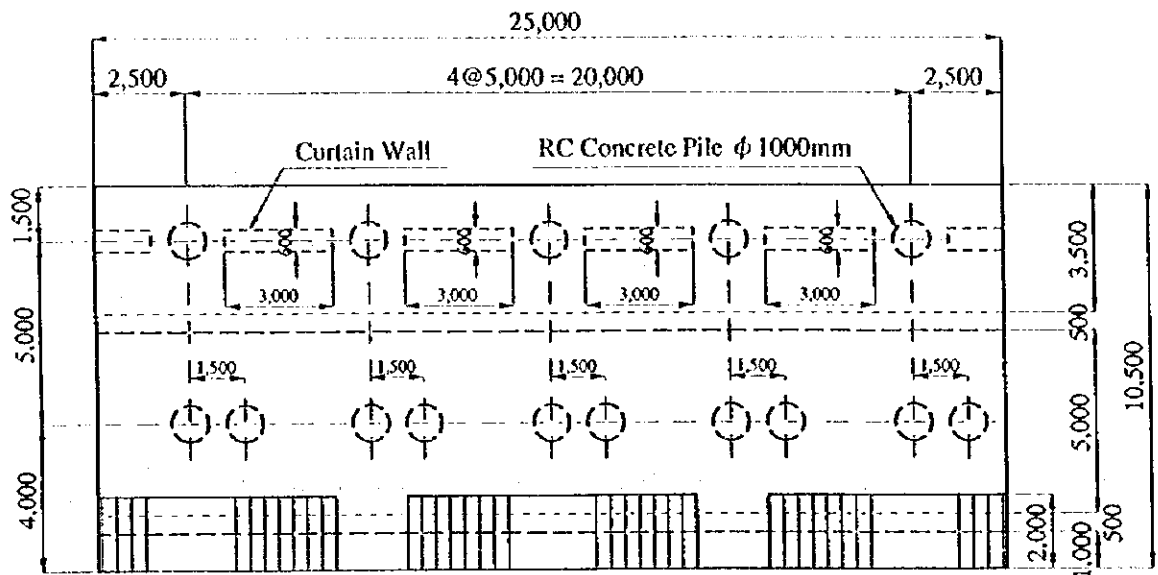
Typical Cross Section of Inner Breakwater
